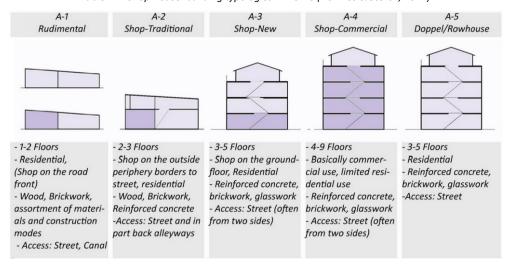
Five shop-house dwelling types in HCMC (1: rudimental house, 2: traditional shop-house, 3: new shop-house, 4: commercial shop-house, 5: row house)
